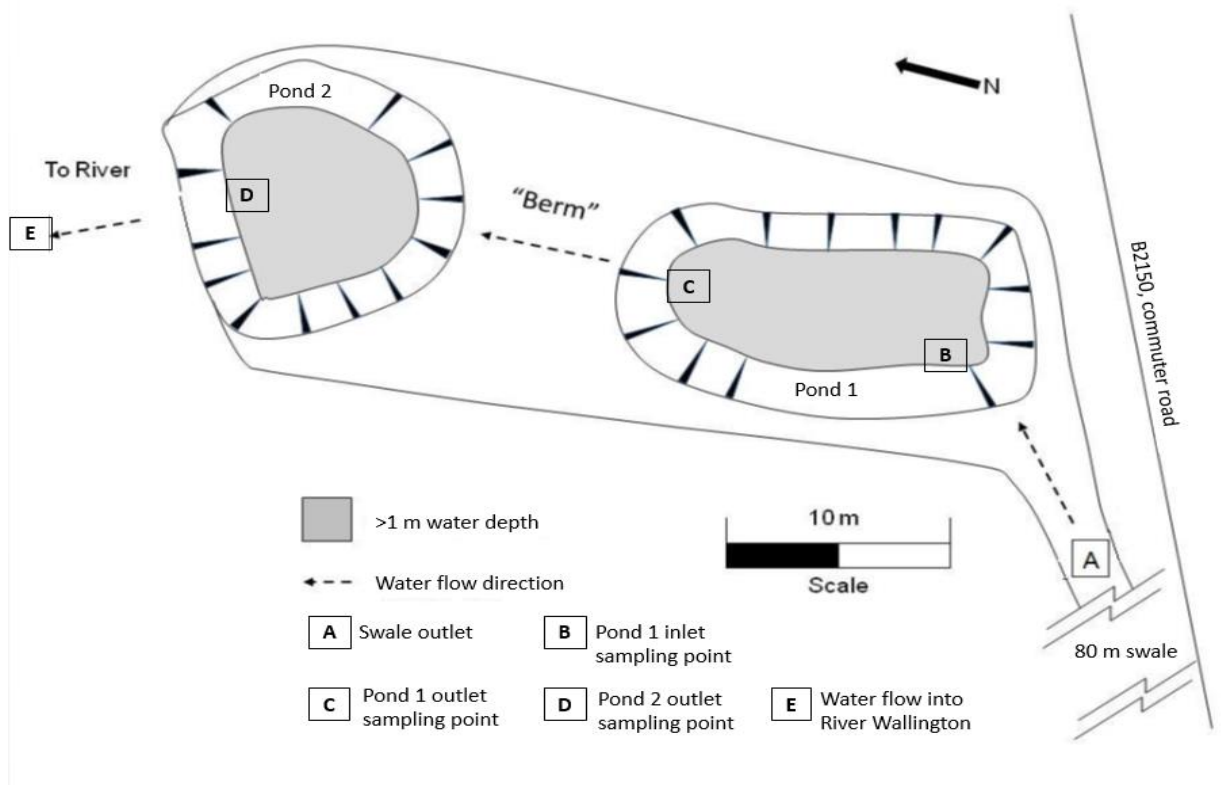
Schematic view of the SuDS system in Waterloooville. Water flows along the swale into Pond 1 into Pond 2 before it is discharged into the River Wallington. Water samples taken from Pond 1 inlet [B], Pond 1 outlet [C] and Pond 2 outlet [D]. Sediment samples taken every 20 m along the swale including by the inlet and outlet pipes. Adapted from Roinas et al. 2014, all measurements are approximate.
